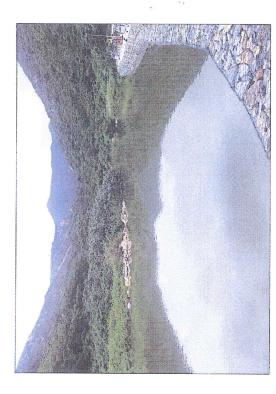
(General View of the Site) 照片 4 (工地概況)
